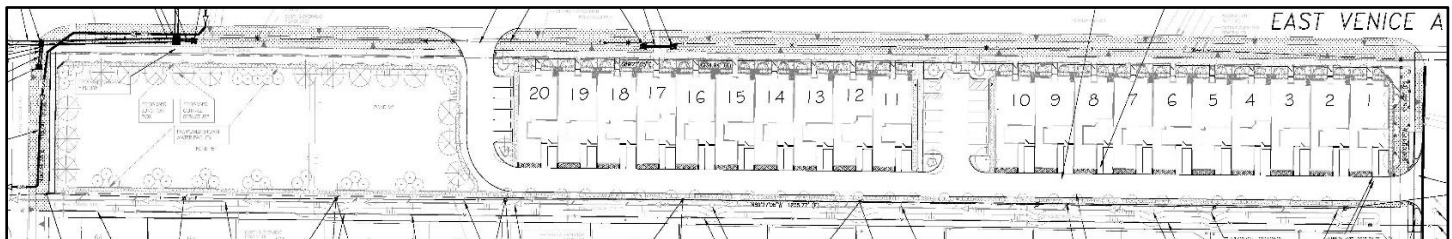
The Site Plan showing improvements and landscaping on the subject property
